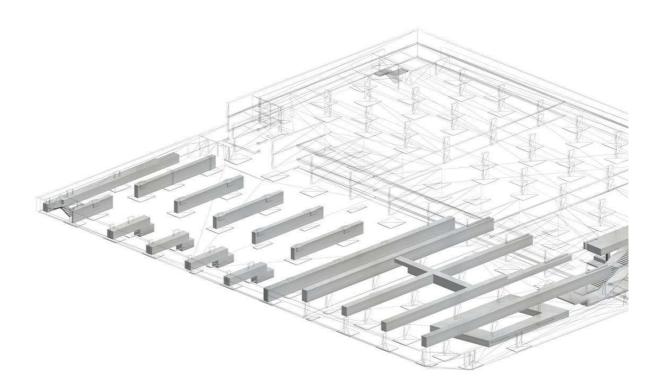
Transfer beams viewed from the south-east in Adelaide Street
